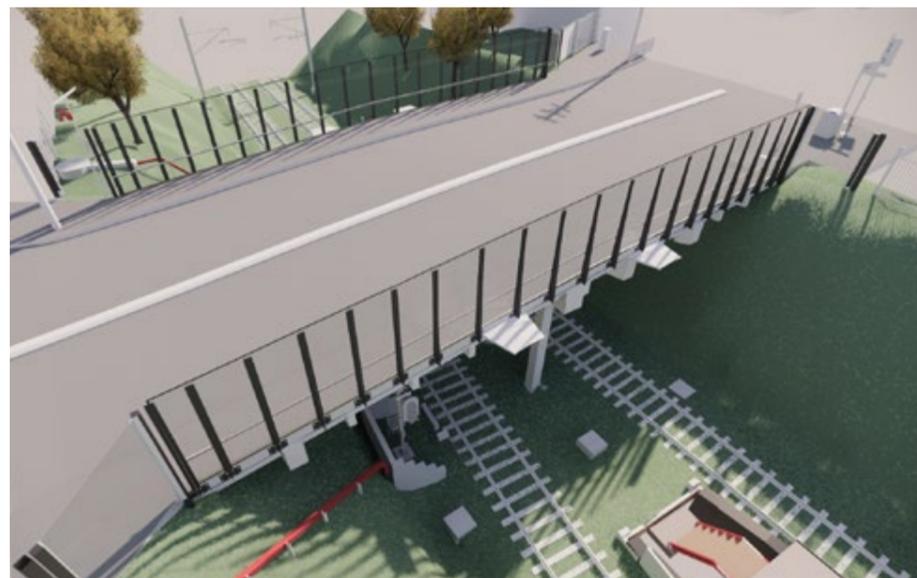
Throw screen arrangement at Haldon Street overbridge
